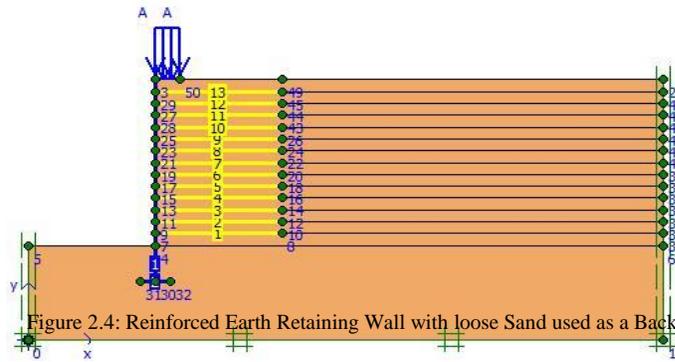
Reinforced Earth Retaining Wall with loose Sand used as a Backfill Material.
